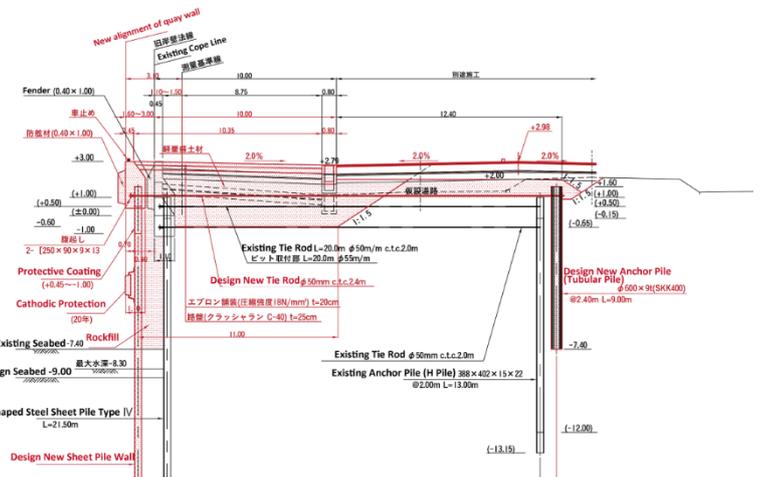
New Installation of steel sheet piles of designed water depth - 7m quay¹³⁾
